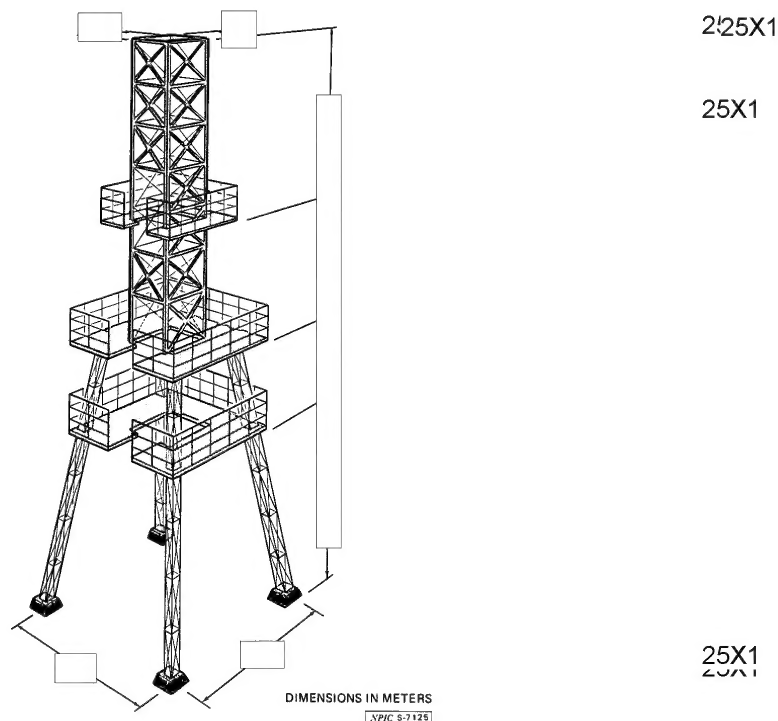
LINE DRAWING OF LIQUID ENGINE TEST STAND IN THE ROCKET MOTOR TEST AREA
